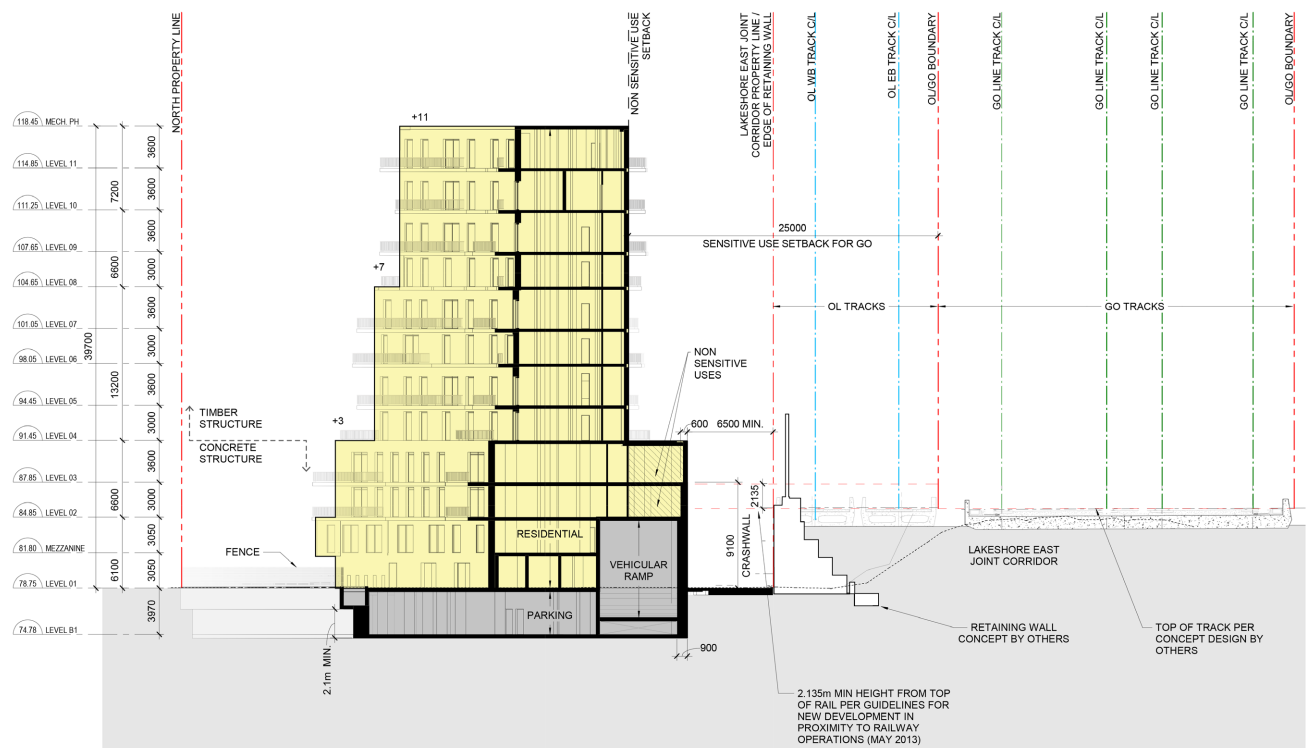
Cross Section at Lakeshore East Joint Rail Corridor and the TOC site.
